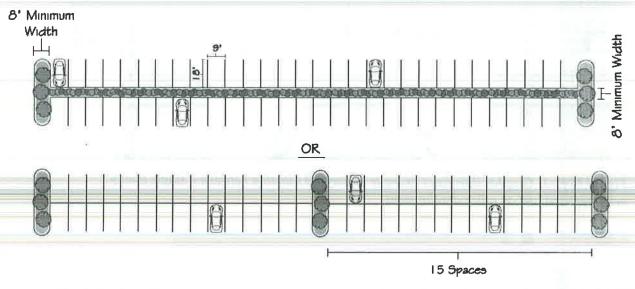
The graphic represents the two options for landscaped areas within parking lots. The top option illustrates the eight food planting strip and the bottom option illustrates parking islands every 15 spaces.
